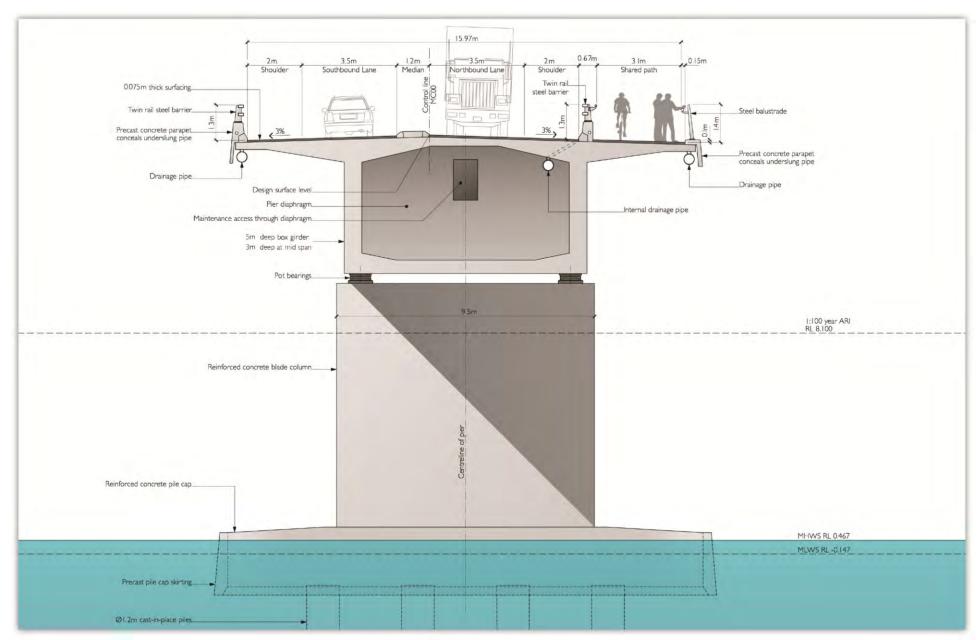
Bridge cross-section 2 (bridge spanning river)
